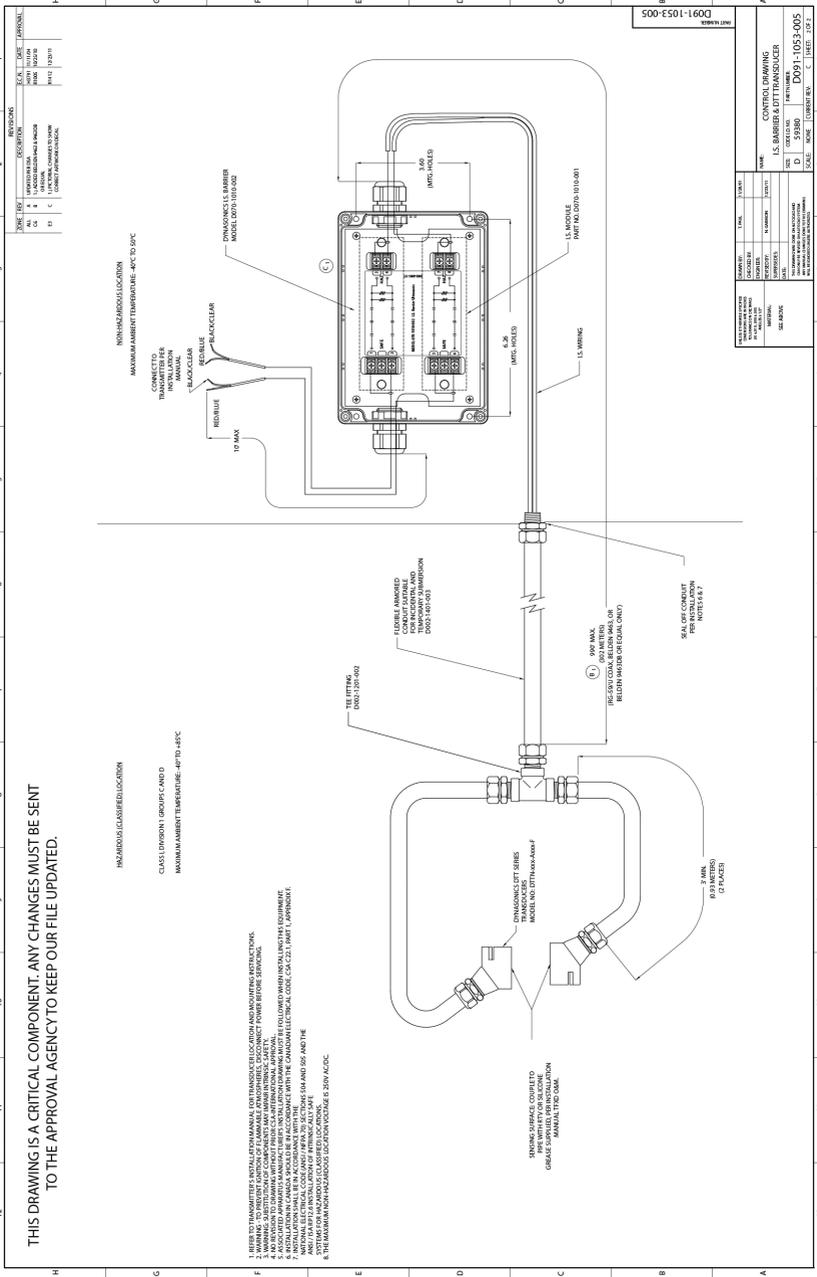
Control drawing I.S. barrier UTT10-050S(X)F transducer flexible conduit
